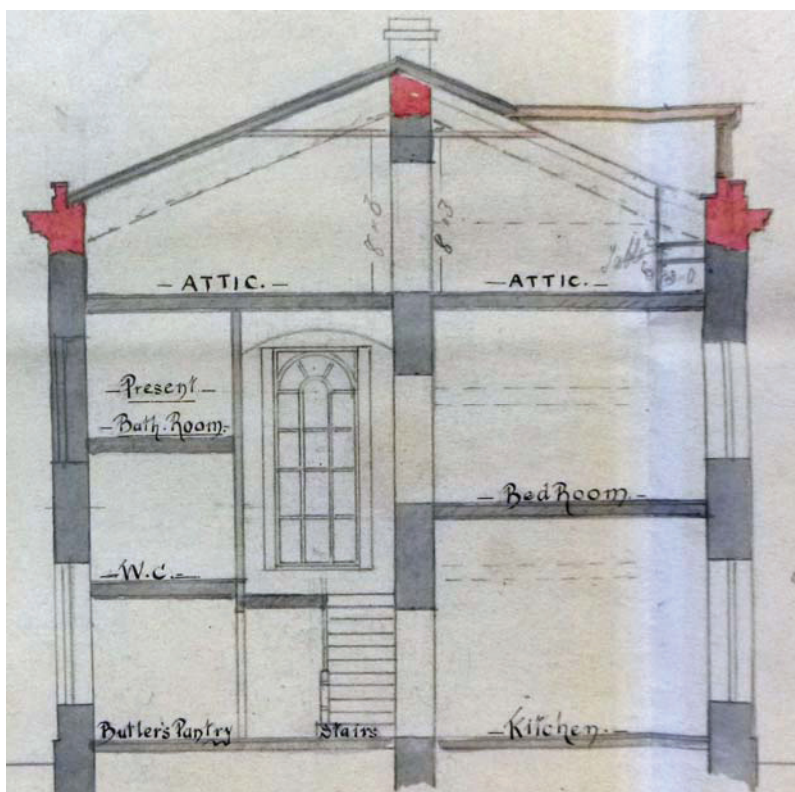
Proposed cross-section on line AB showing roof raised in red, 1889
